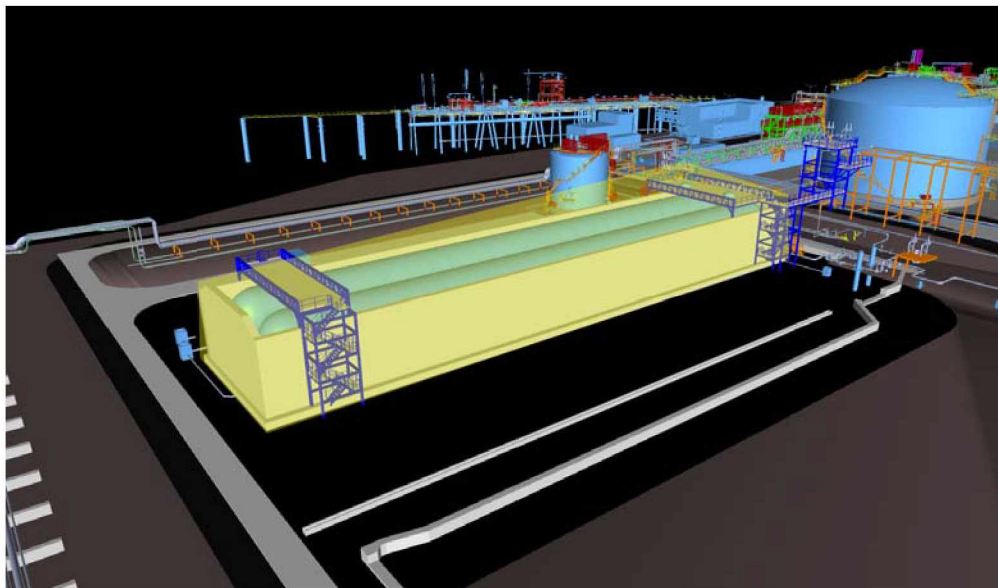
Concrete foundation and basin for new Storage Tanks 40FB-18/19
